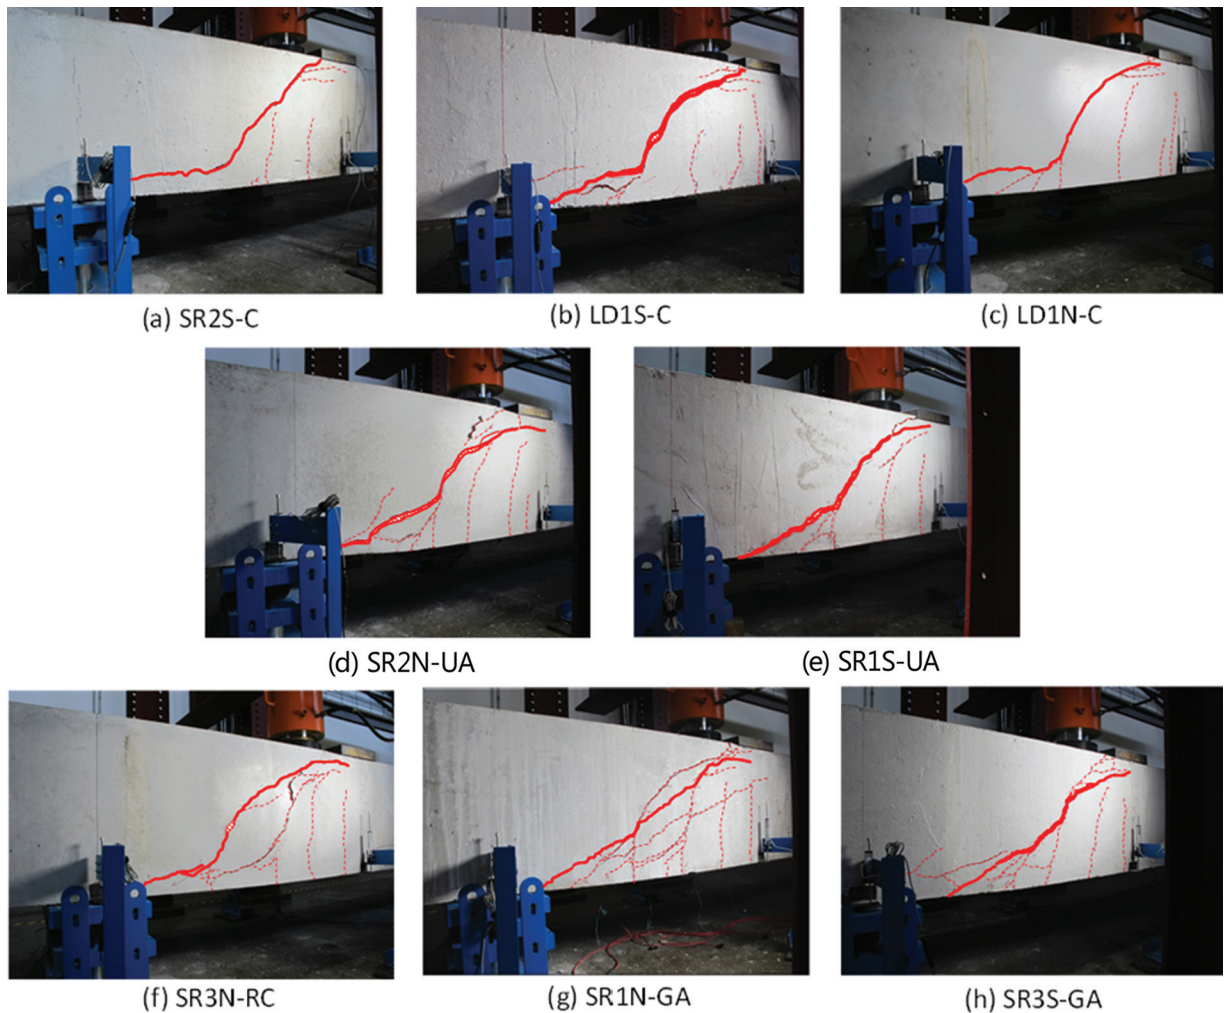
Diagonal cracking pattern at failure for all specimens. Primary shear crack shown as a solid line.
